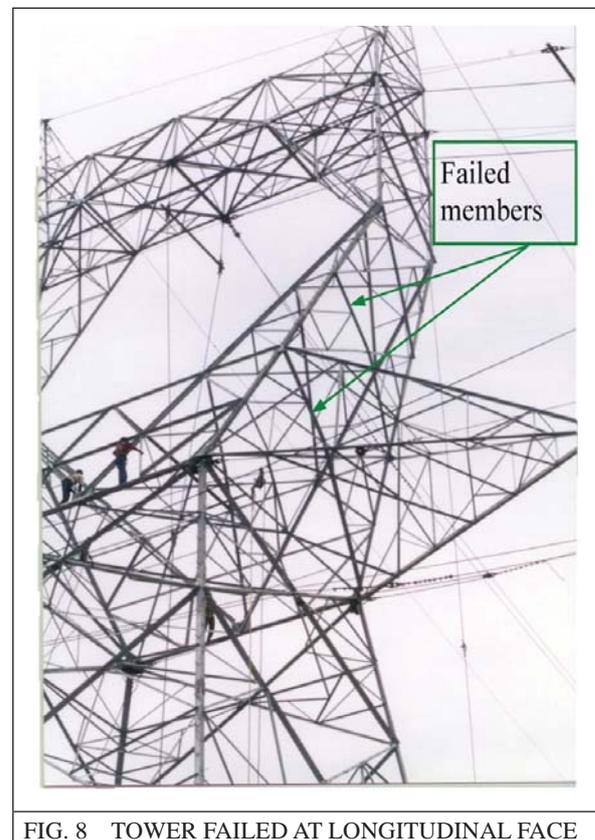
TOWER FAILED AT LONGITUDINAL FACE
